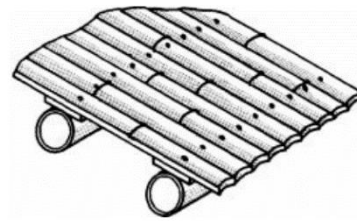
BambooCane Floor Decking (after Janssen, 1995)
